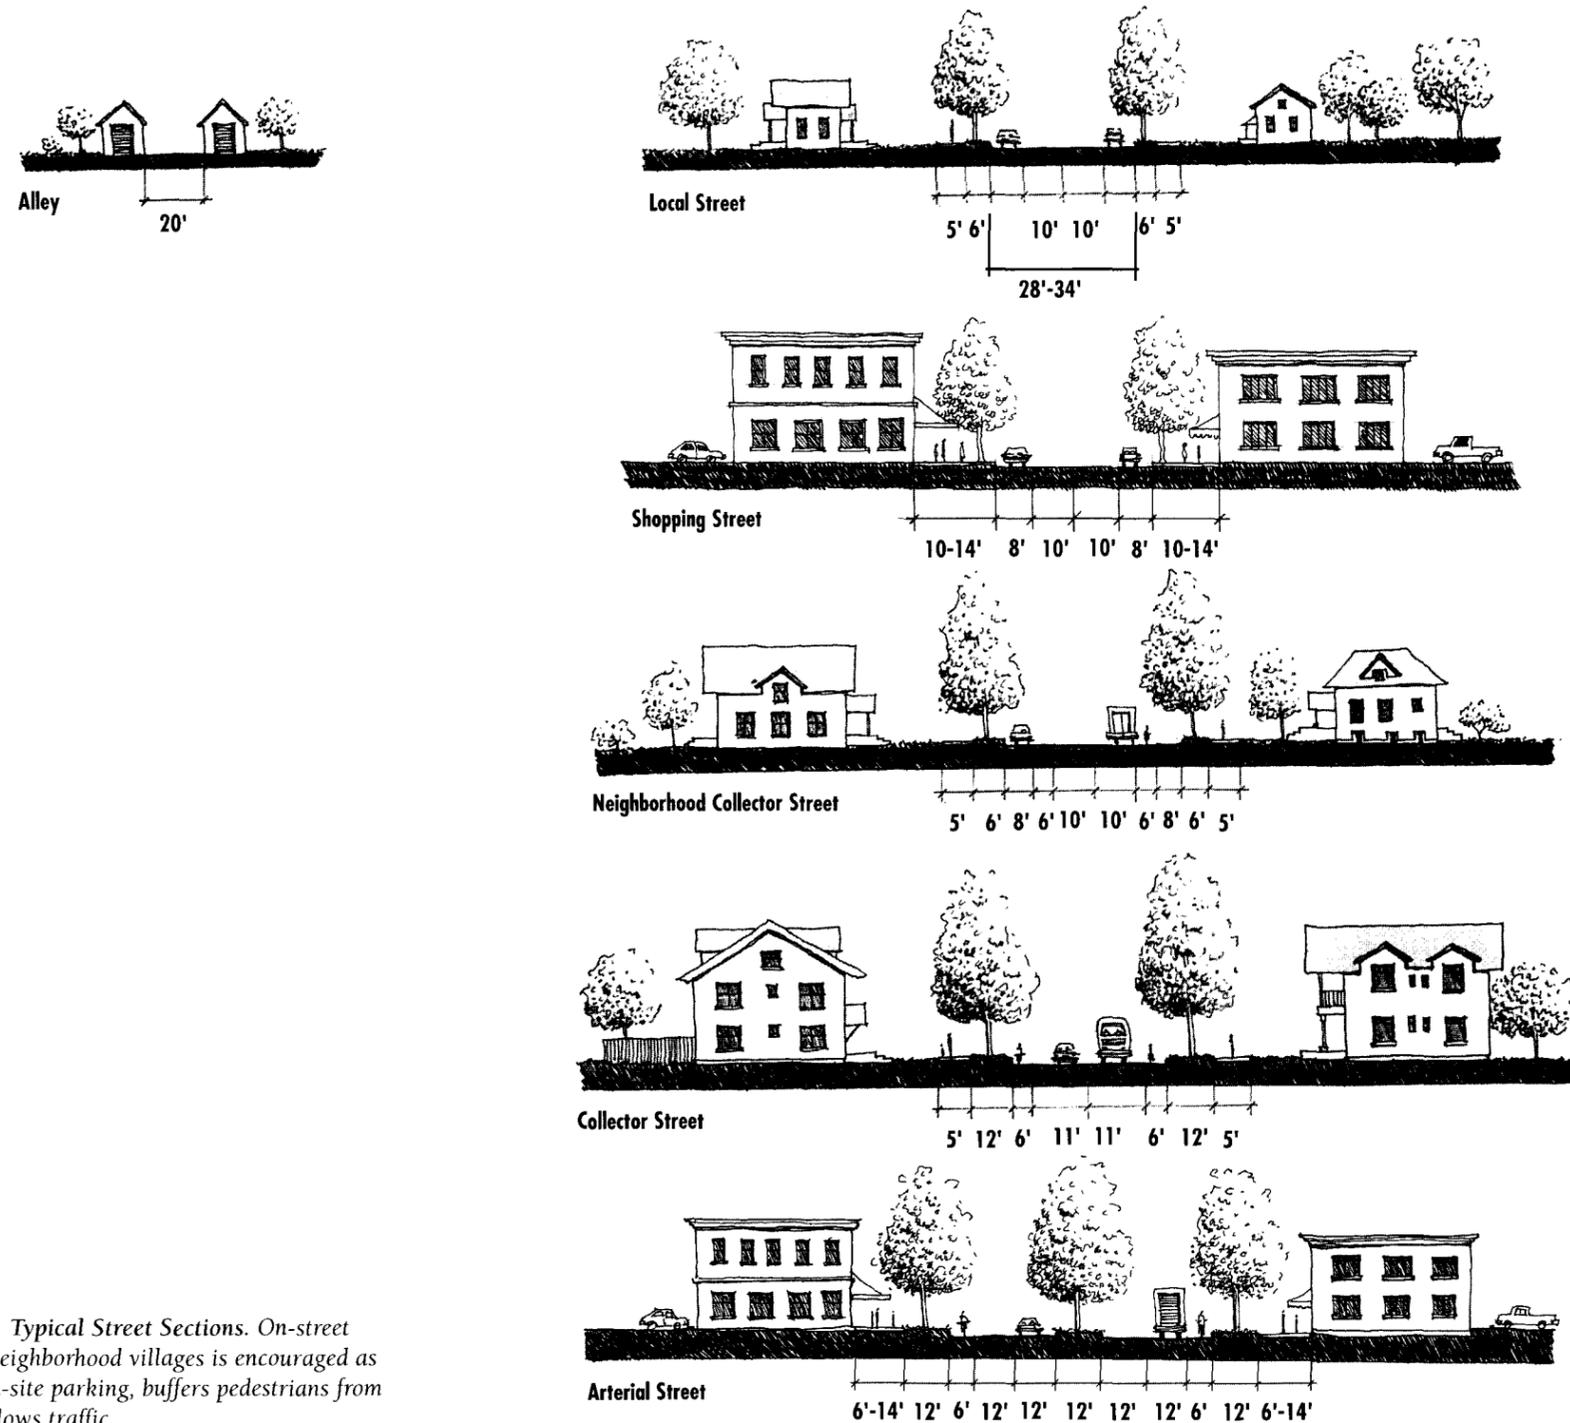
Typical Street Sections. On-street parking in neighborhood villages is encouraged as it reduces on-site parking, buffers pedestrians from traffic and slows traffic.
